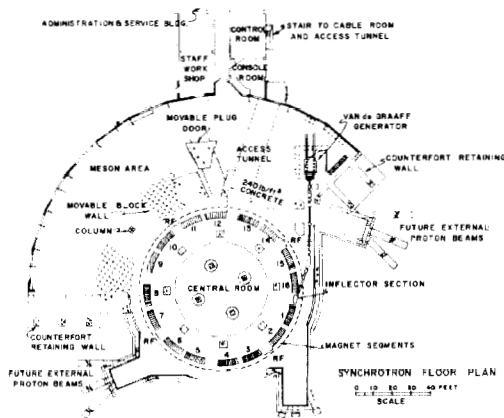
Floor plan of the synchrotron and immediate facilities.
